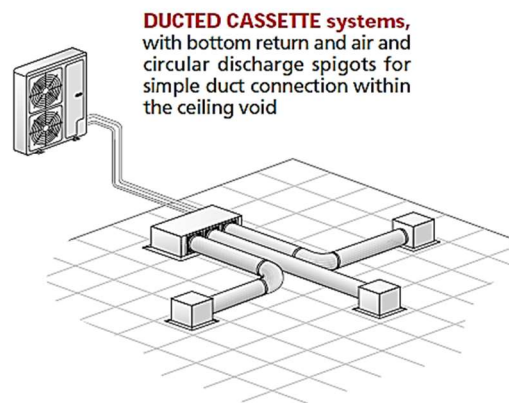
Ducted Split (Source: R407C, the Engineers Guide)
